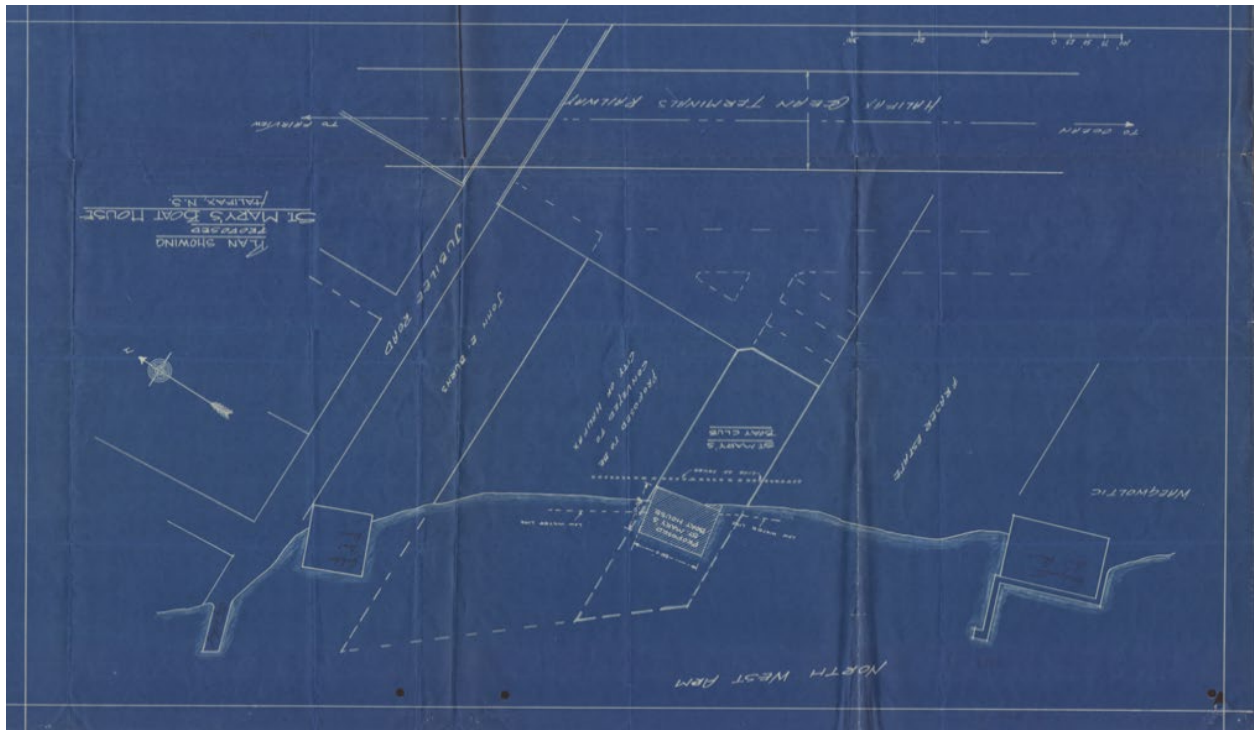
Plan showing proposed location of St. Mary's Boat House, 1918, with adjacent land to be conveyed to the City of Halifax (Surveyor Unknown)
